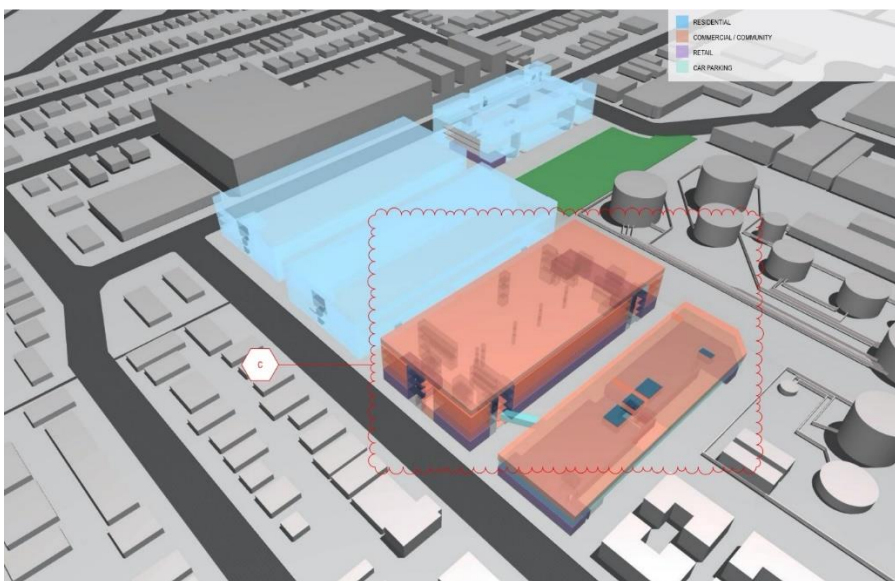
Concept Proposal Massing Imagine (Source: Wickham Woolstores DA Master Plan Report, prepared by Tonkin Zulaikha Greer, Fairweather & City Plan Services)
